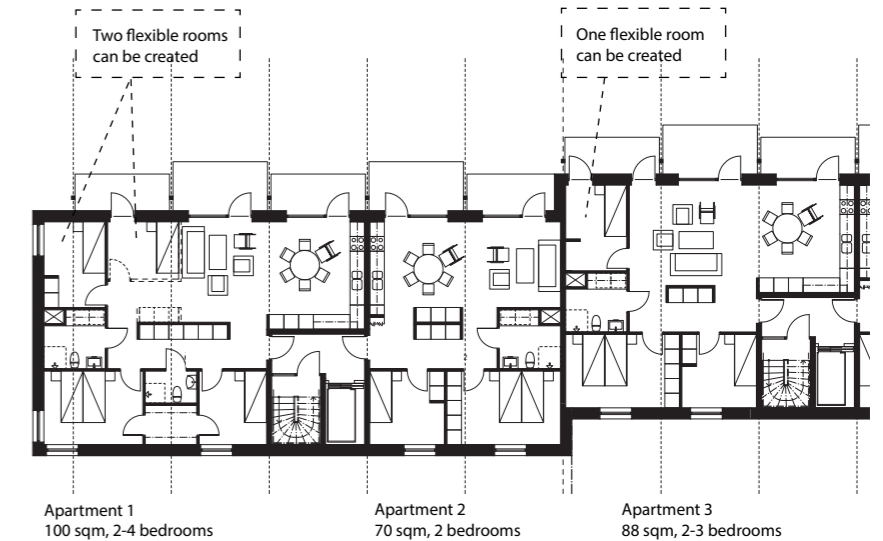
Diagram to show the flexible wall arrangements within the apartments
